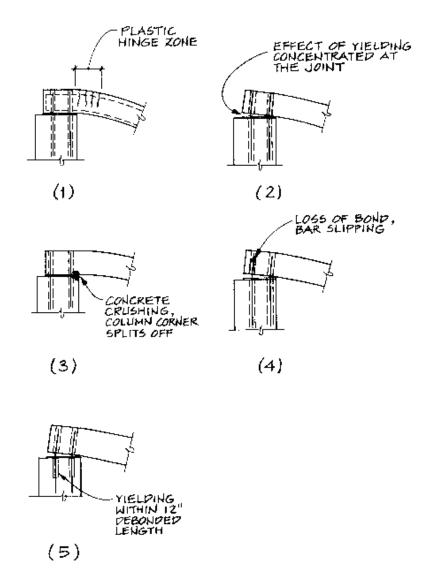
Failure Modes for Grouted Duct Connection [1.32]
